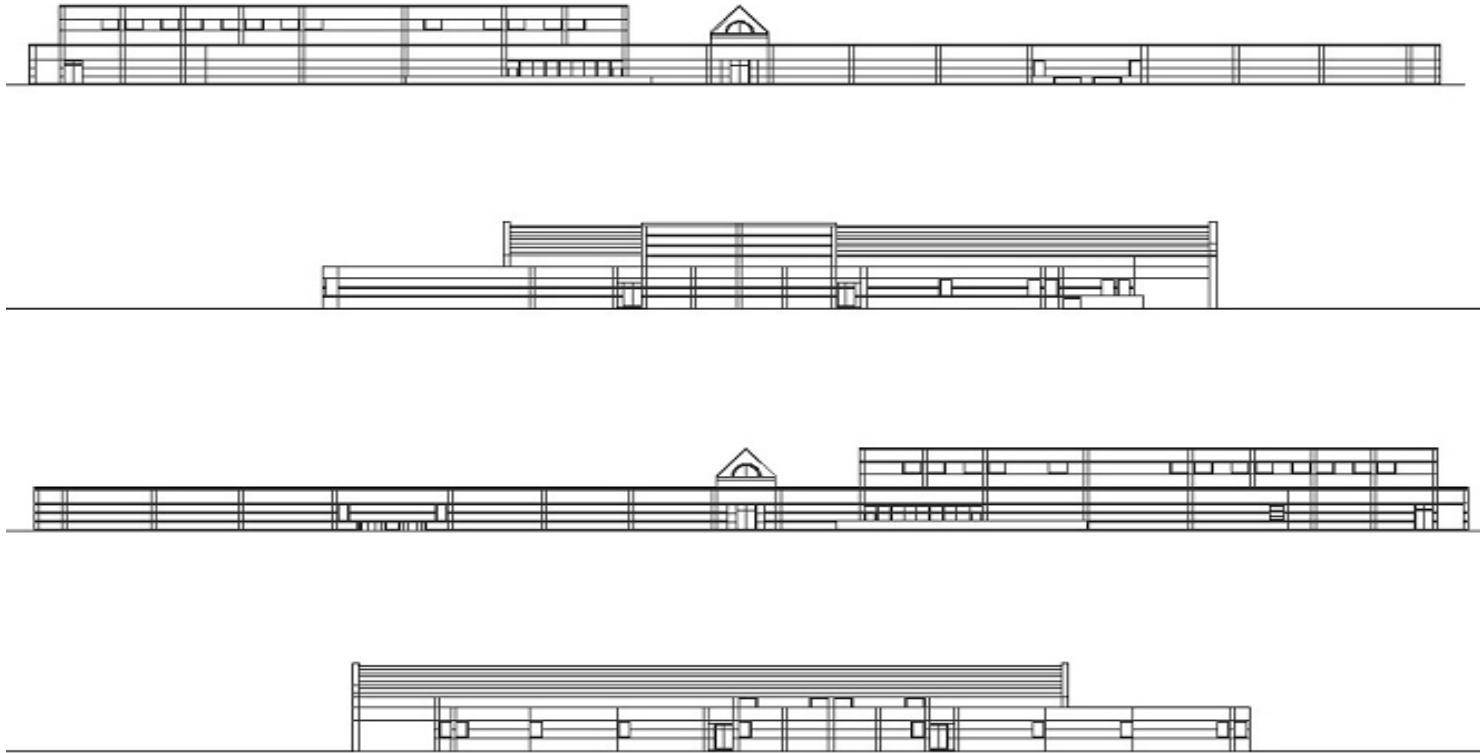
Elevations of the school building (from left-right: north elevation, east elevation, south elevation, and west elevation).
